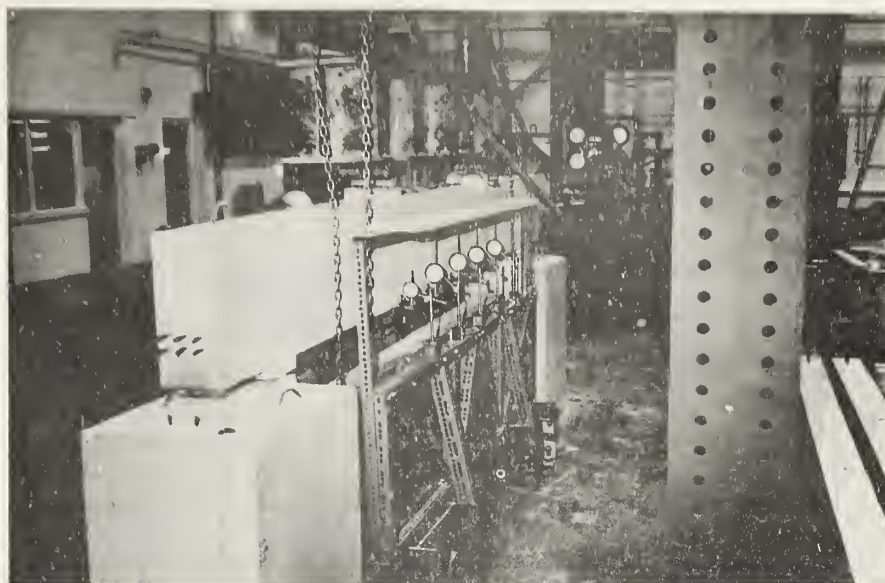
DIAL GAGE ARRANGEMENT
